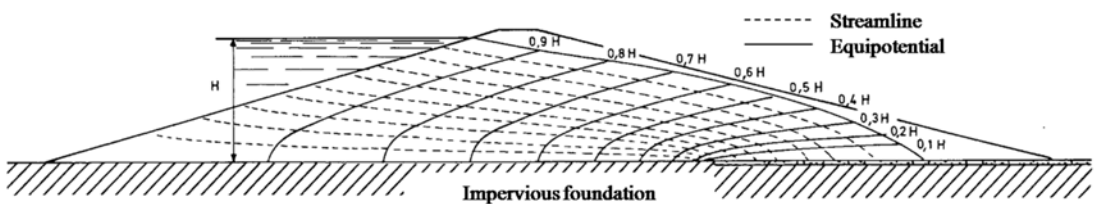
Example of flow net construction in an earthen levee on impervious foundation (adapted from BLR, 1970)
